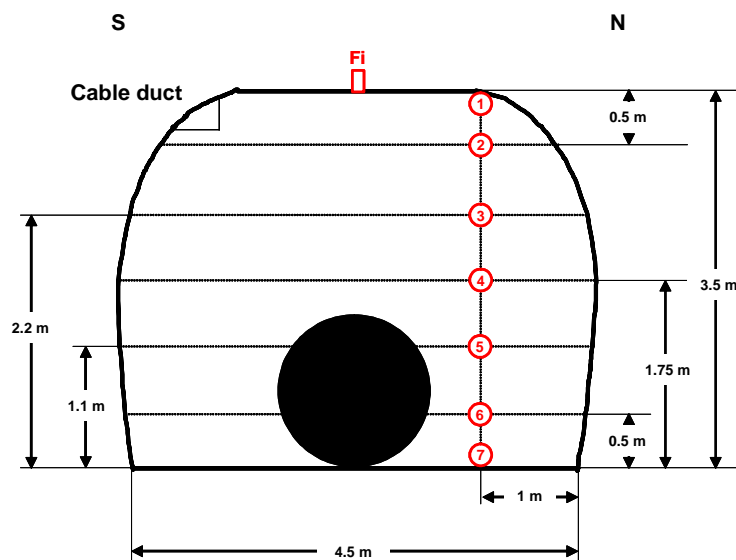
Backfill sampling locations (samples 1 to 7) and rock sampling locations in the roof (samples Fi) for porosity and permeability measurements in cross section D1
